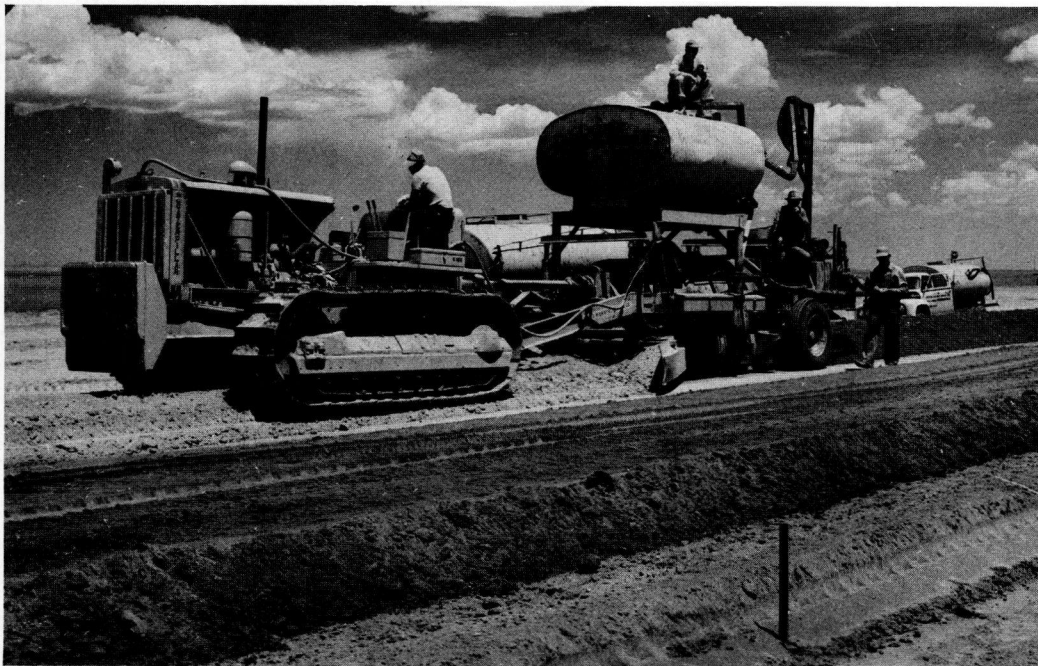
One type of traveling mixing plant processing a windrow of soil and cement.
